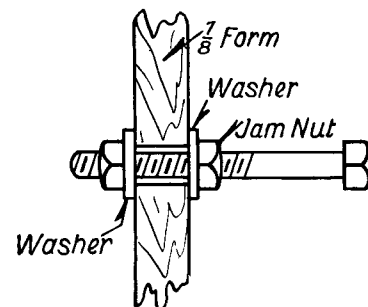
Method of Setting Anchor Bolts with Jam Nuts Inside Form to Hold Bolt in Place
